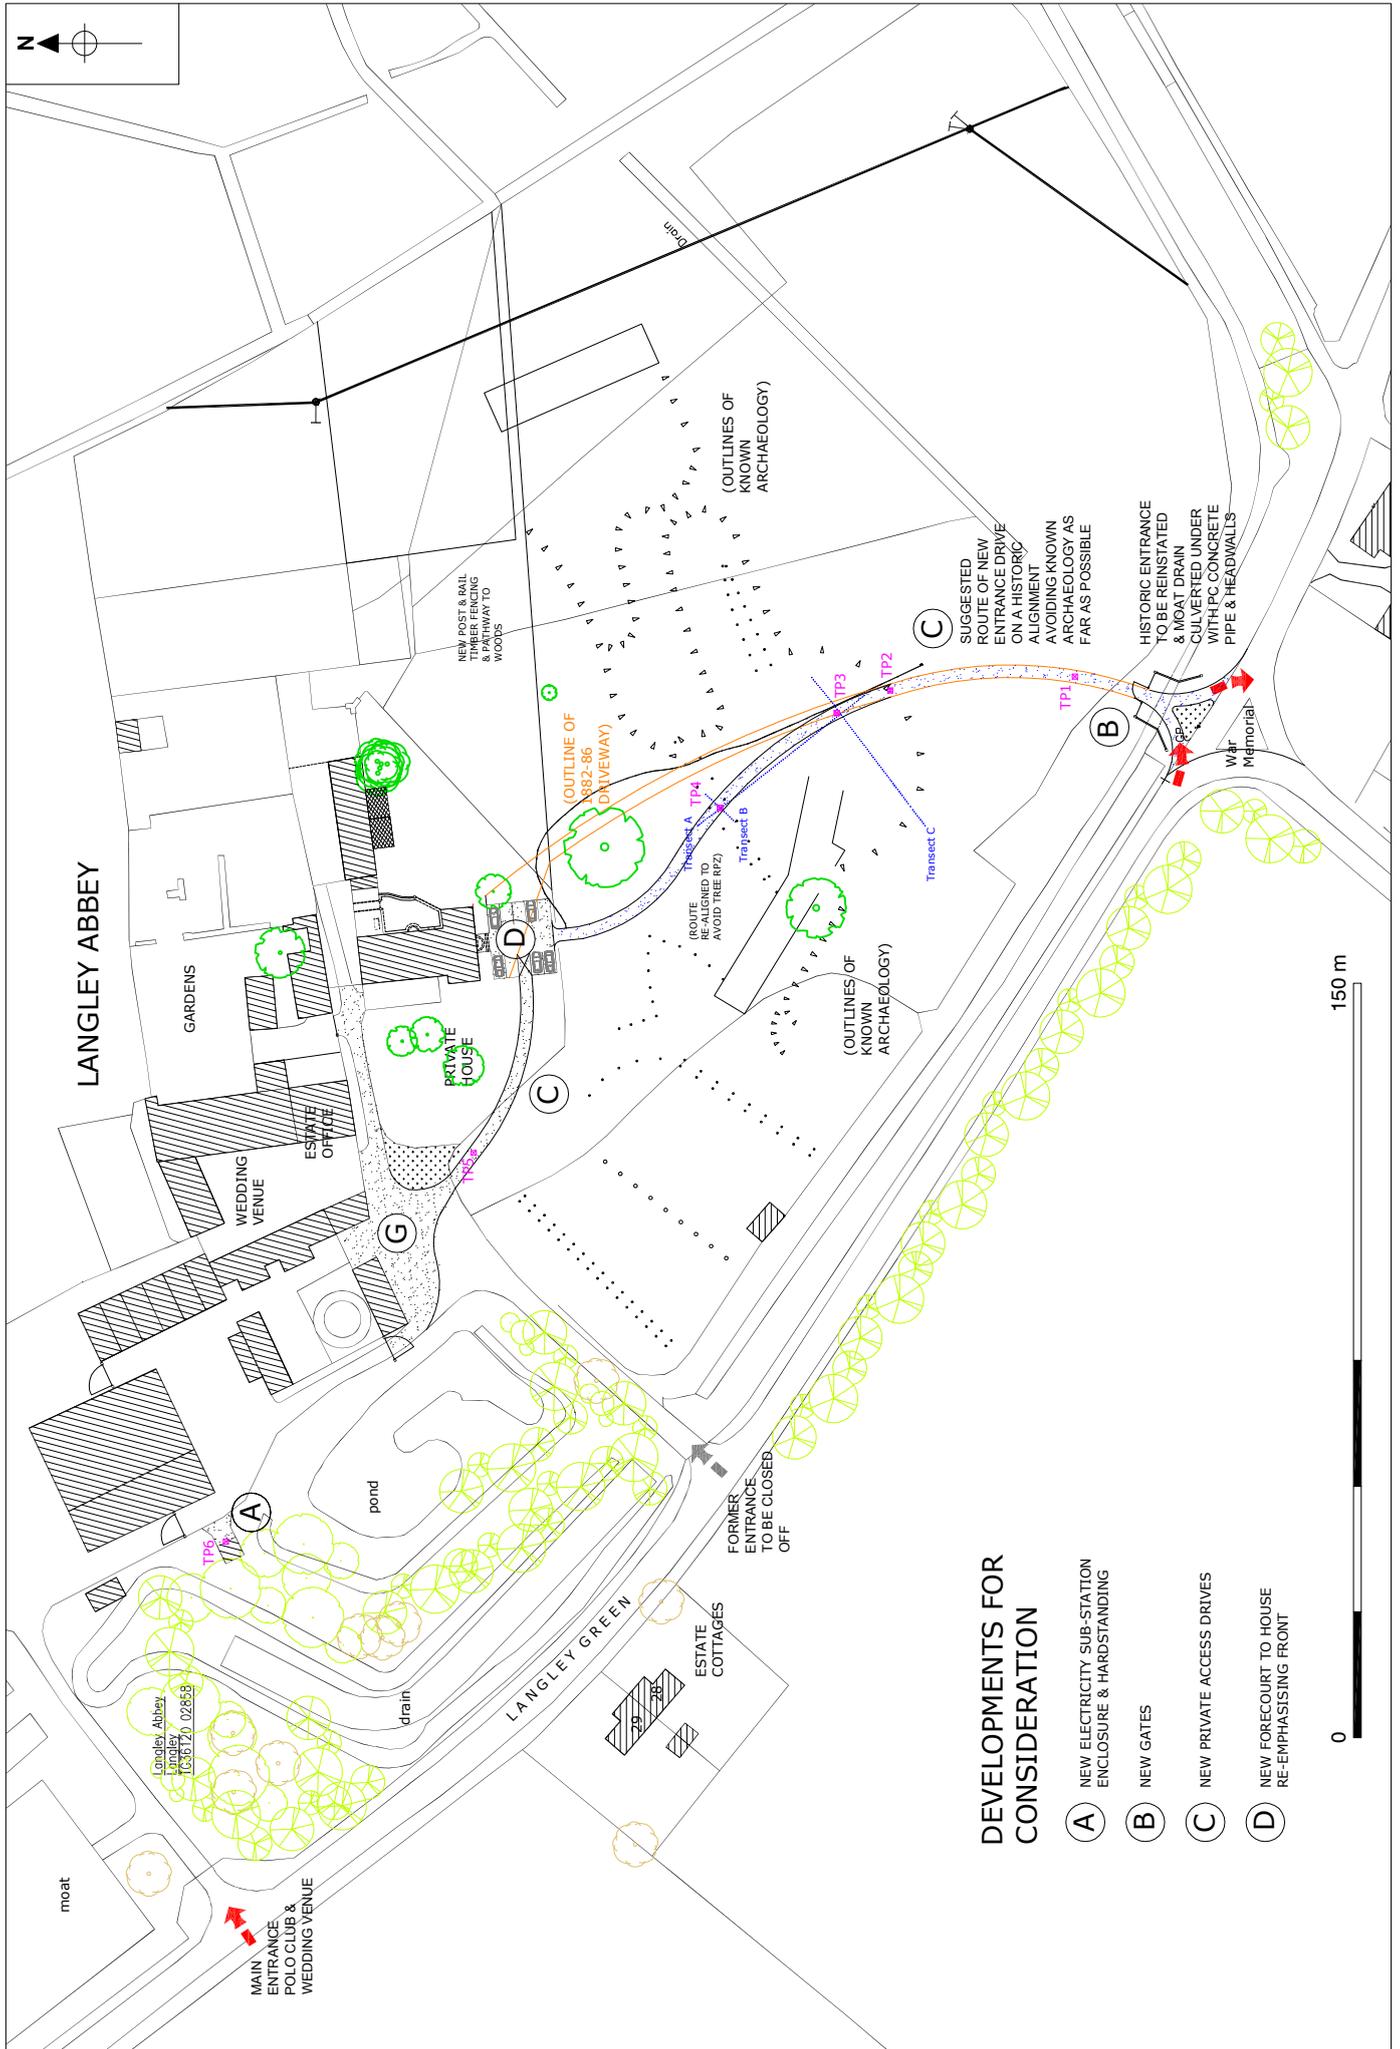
Site plan (base plan provided by C D Design). Scale 1:1500
